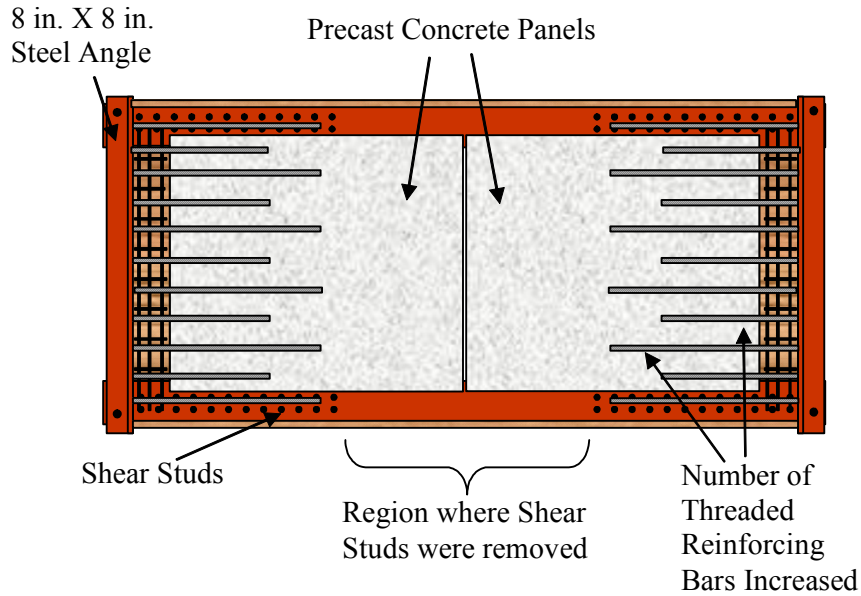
Top view of Phase II LSB D before cast-in-place concrete (shows formwork)
